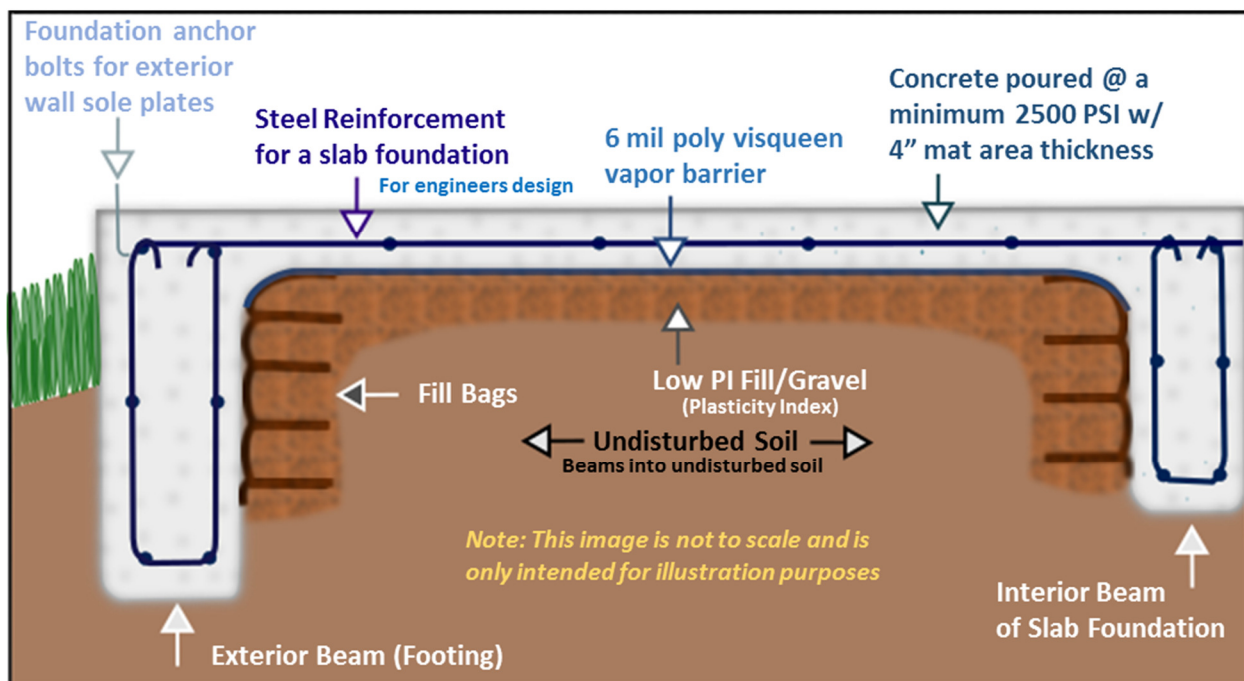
Reinforced Slab on Grade Foundation (source: JWK Inspectors)
